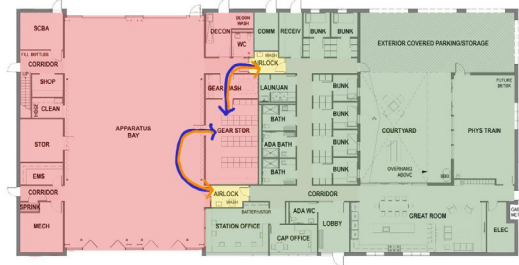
Diagram Over Tukwila Fire Station 52 Floor Plan <sup>58</sup>
